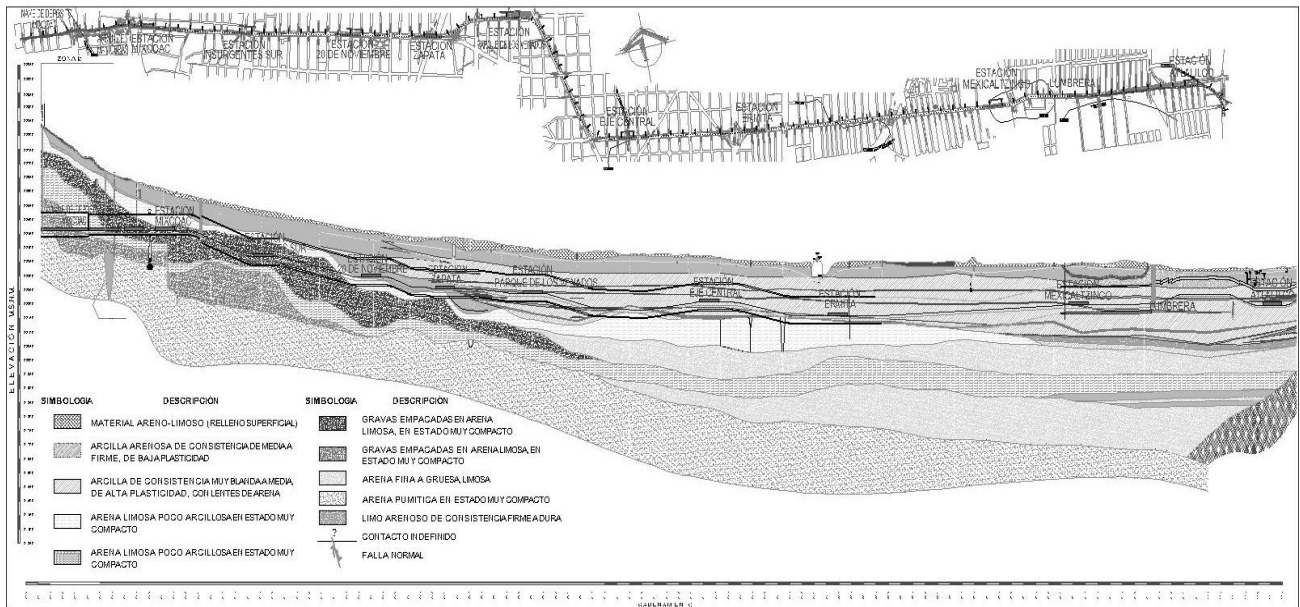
Stratigraphic profile of the underground section of Metro Line 12.
